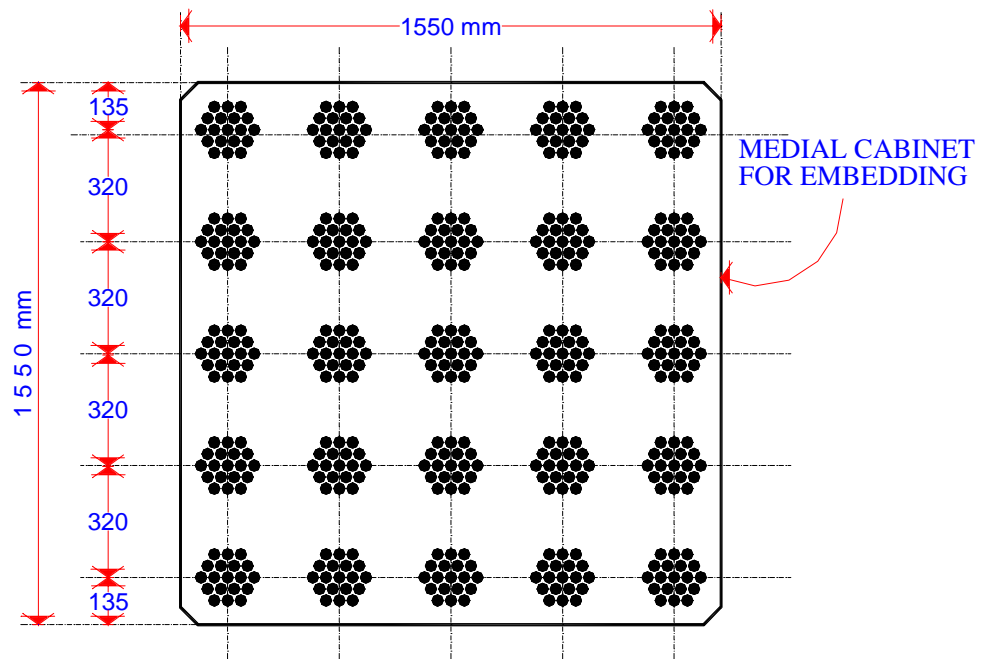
Multicolumn Plant with 475 Bars grouped in 25 Packs
